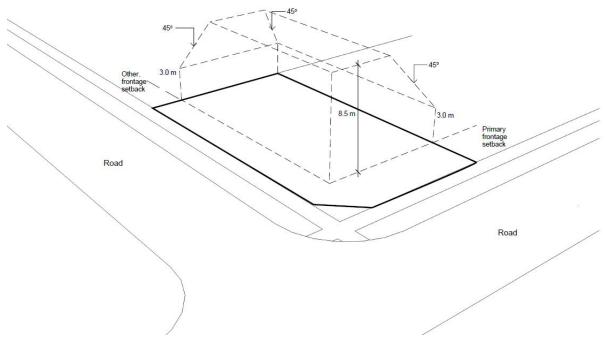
Building envelope for corner lots as required by clause 10.4.2 A3(a)
